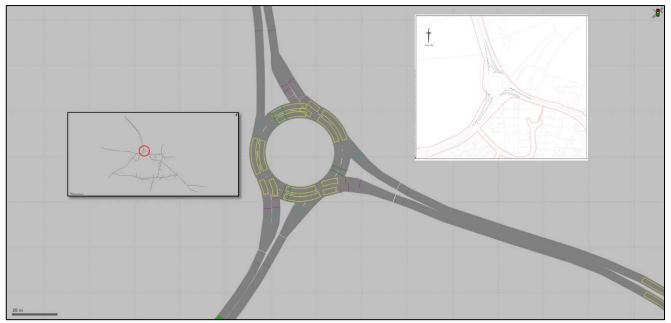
Proposed roundabout upgrade at the A6/Wistow Road junction.
